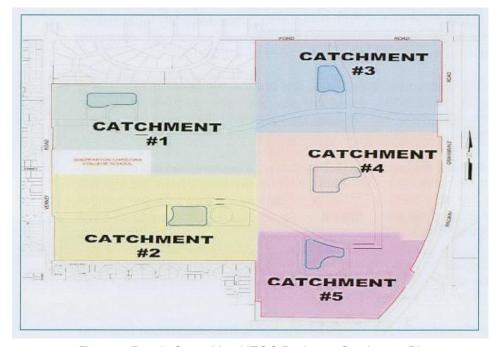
Reeds Consulting NEGC Drainage Catchment Plan.
